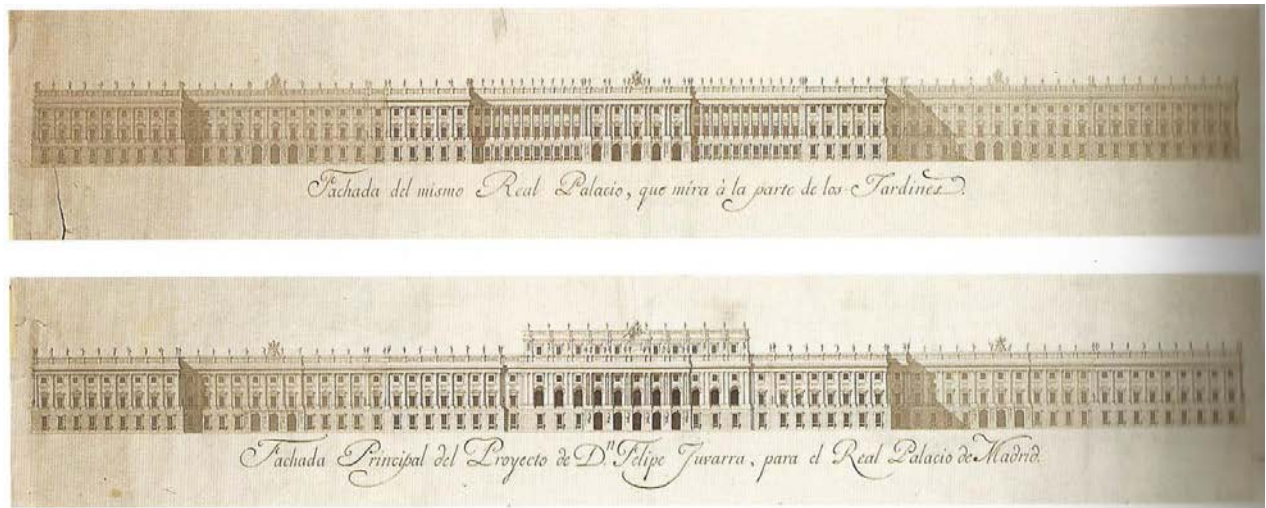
Façade giving to the gardens and Main façade, planned by D. Felipe Juvarra for the Royal Palace
